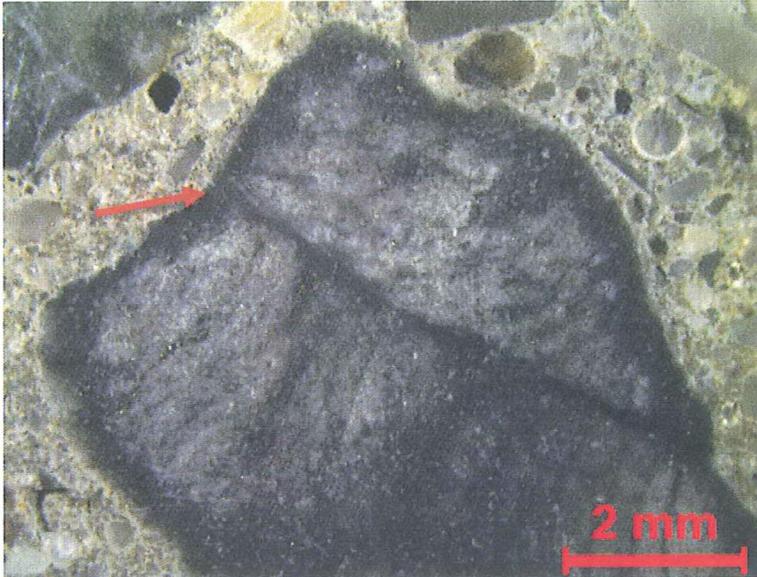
Lapped section of Core 9 showing branch out of the longitudinal crack (arrows).
